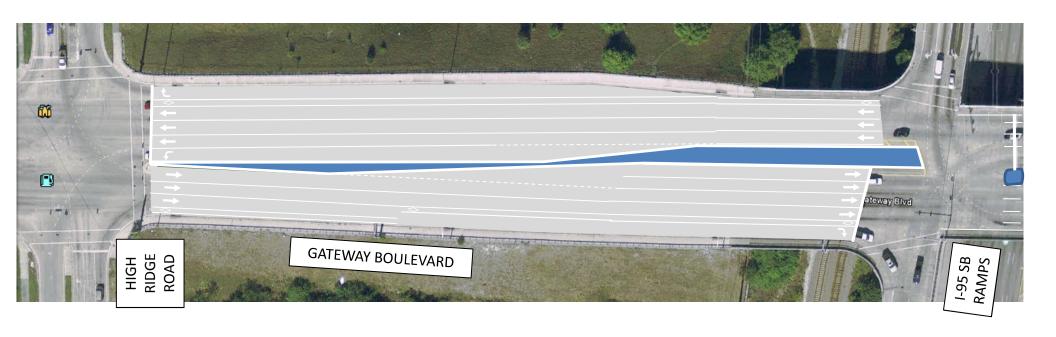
PROPOSED GATEWAY BOULEVARD RECONFIGURATION
